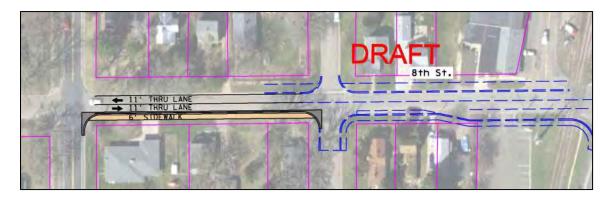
8th Street Alternative 2 – Retain On-Street Parking on South Side - Add Sidewalk
